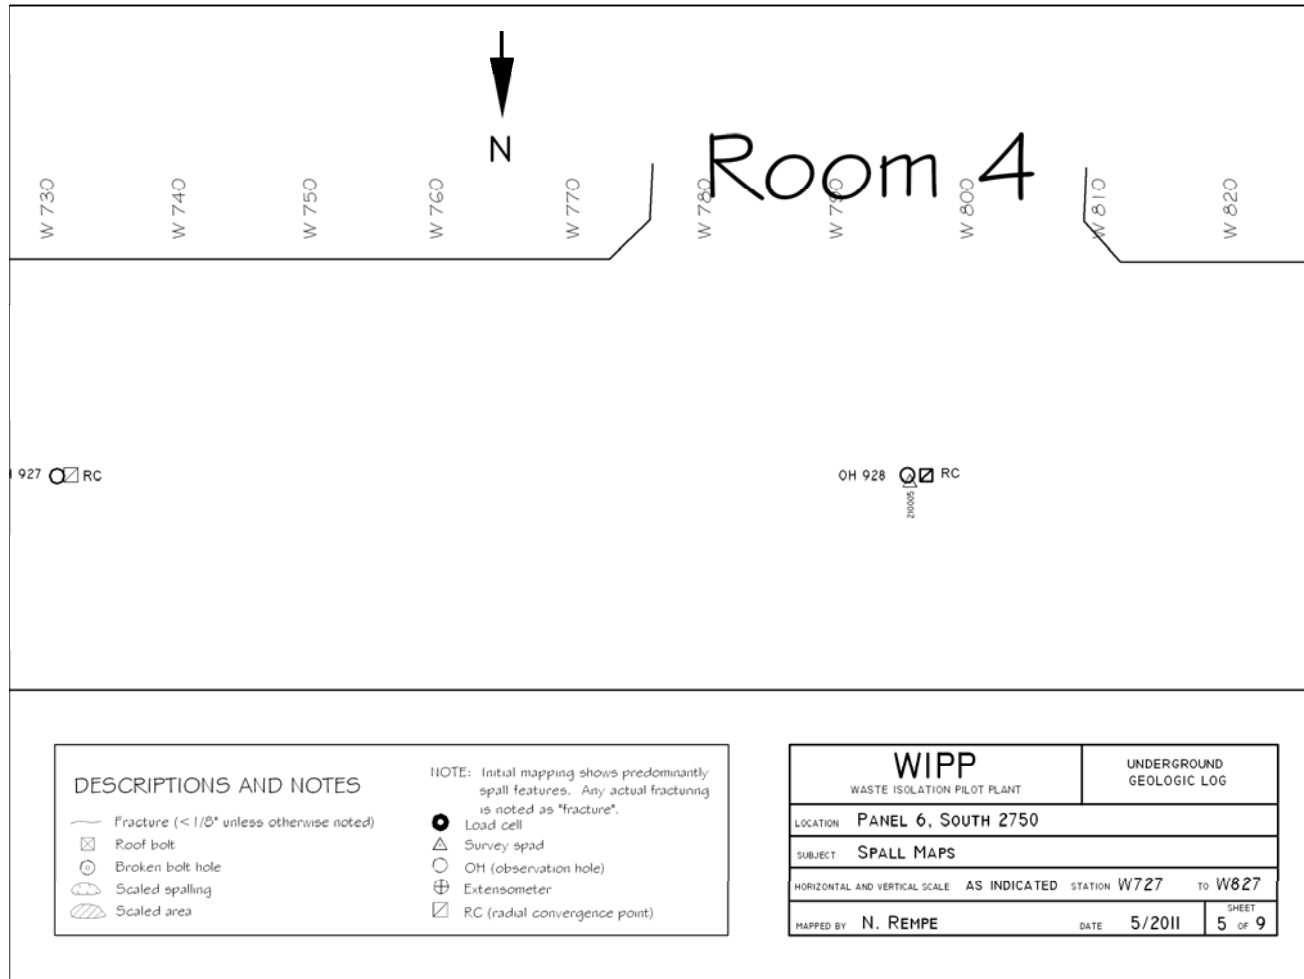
Panel 6 S2750, W390-W1210 Roof Fractures (Sheet 5 of 9)
